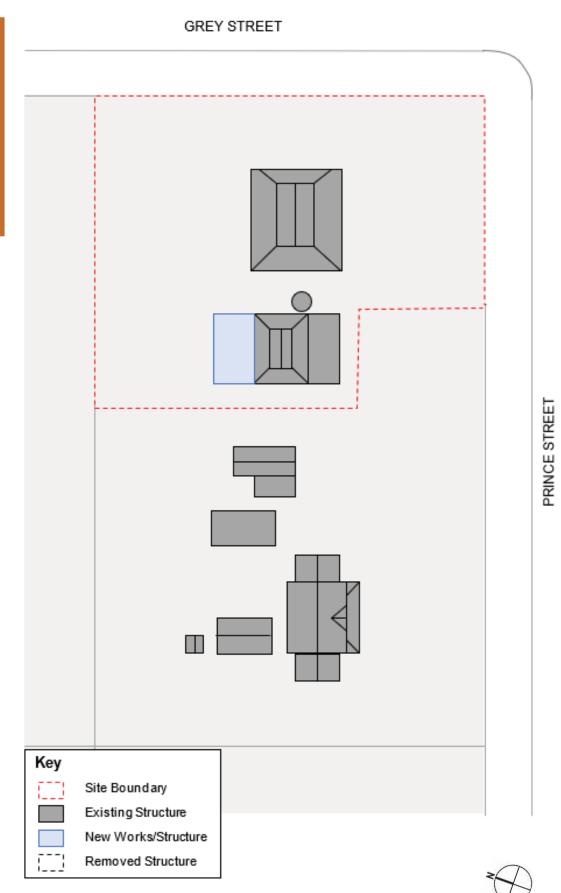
Clarence Town Courthouse and site period of construction - 2013
